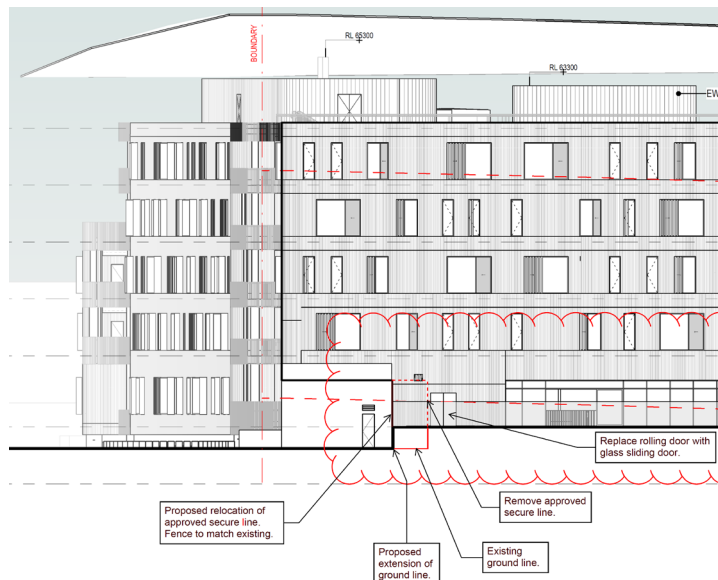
Extract of proposed south elevation (Source: Alleanza Architecture)
